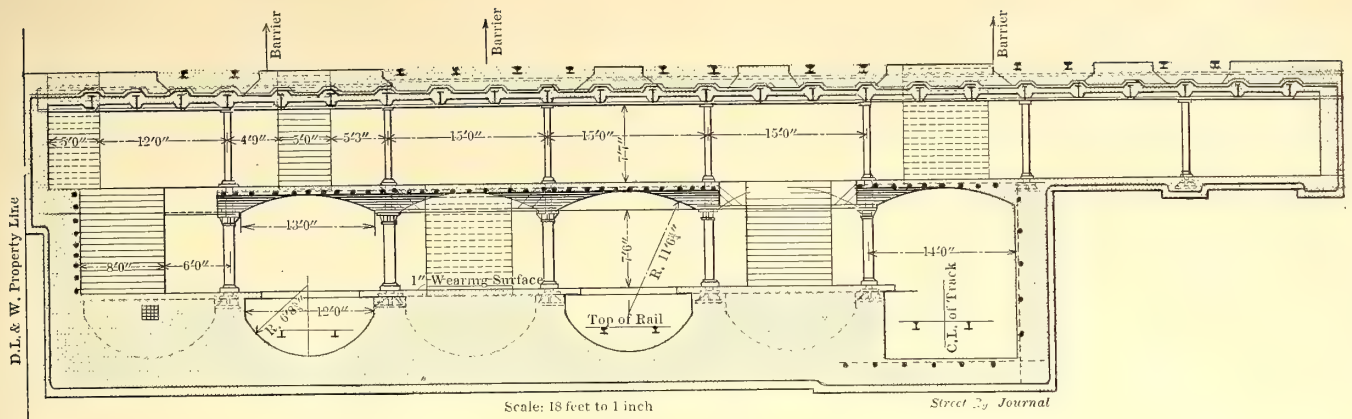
CROSS SECTION AT HOBOKEN TERMINAL
